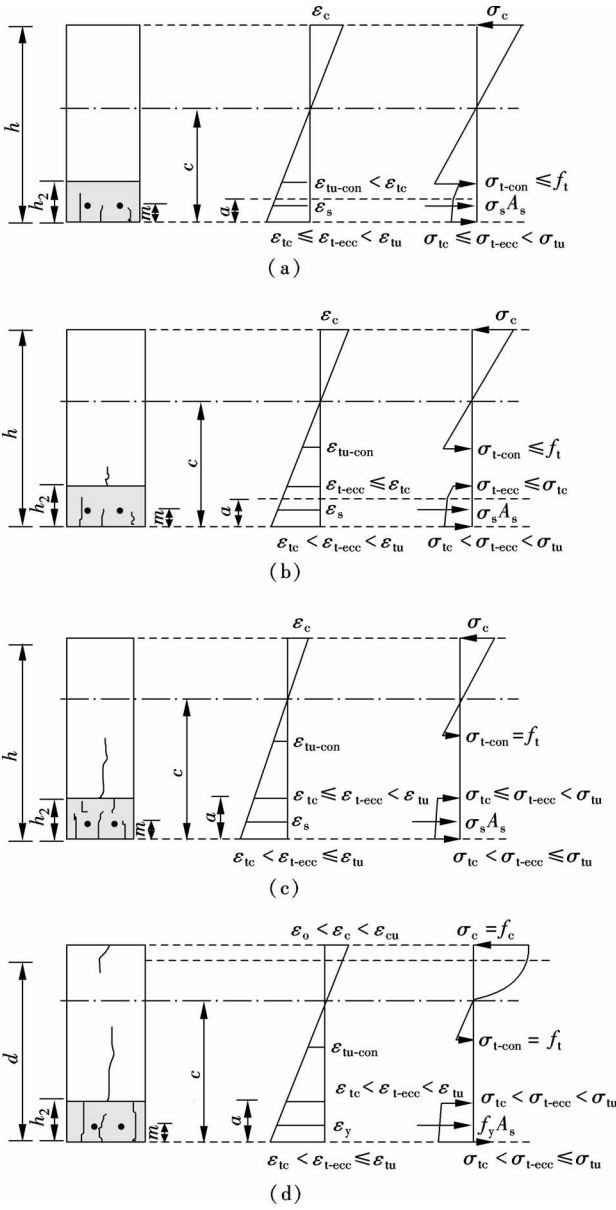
Stress distributions of composite beam in work stage (a) Cracking of ECC layer; (b) Cracking in both ECC and concrete; (c) Further extension of cracks in both ECC and concrete; (d) Yielding of steel reinforcement
